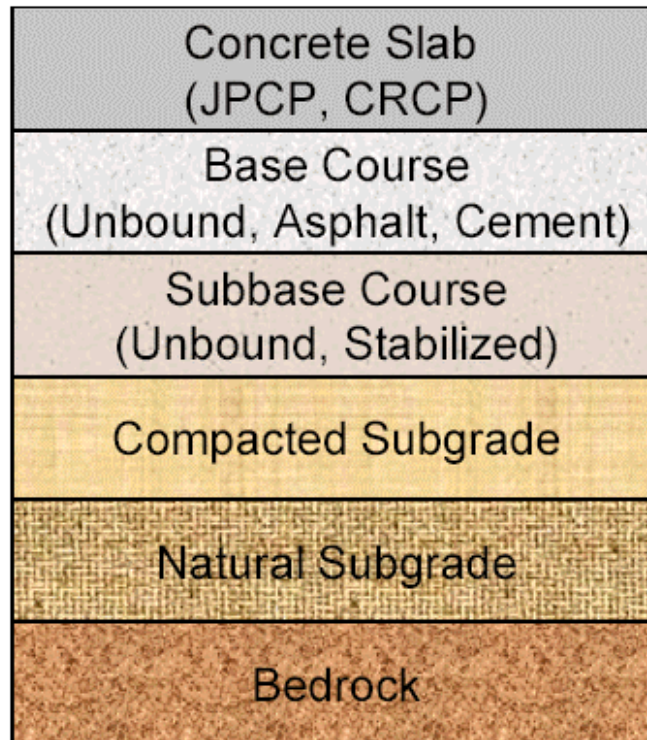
Variations for rigid pavement section (NCHRP 1-37A, 2002).
